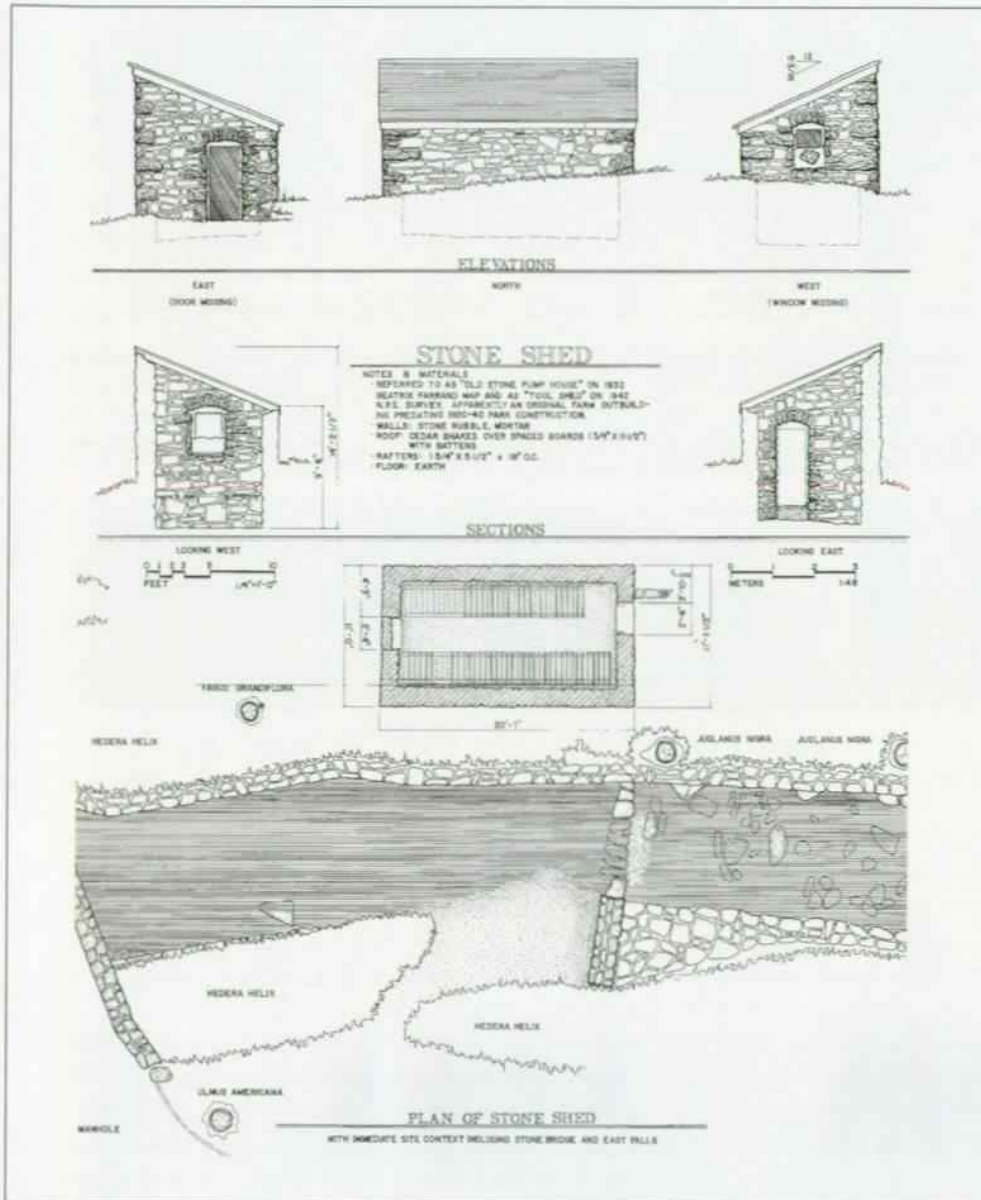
Detail drawing of the Old Stone Pump House (HABS called it the Stone Shed). HABS, Summer 1989, NCR, Plans and Drawings Collection, #863/80015 (Sheet 17 of 28).
